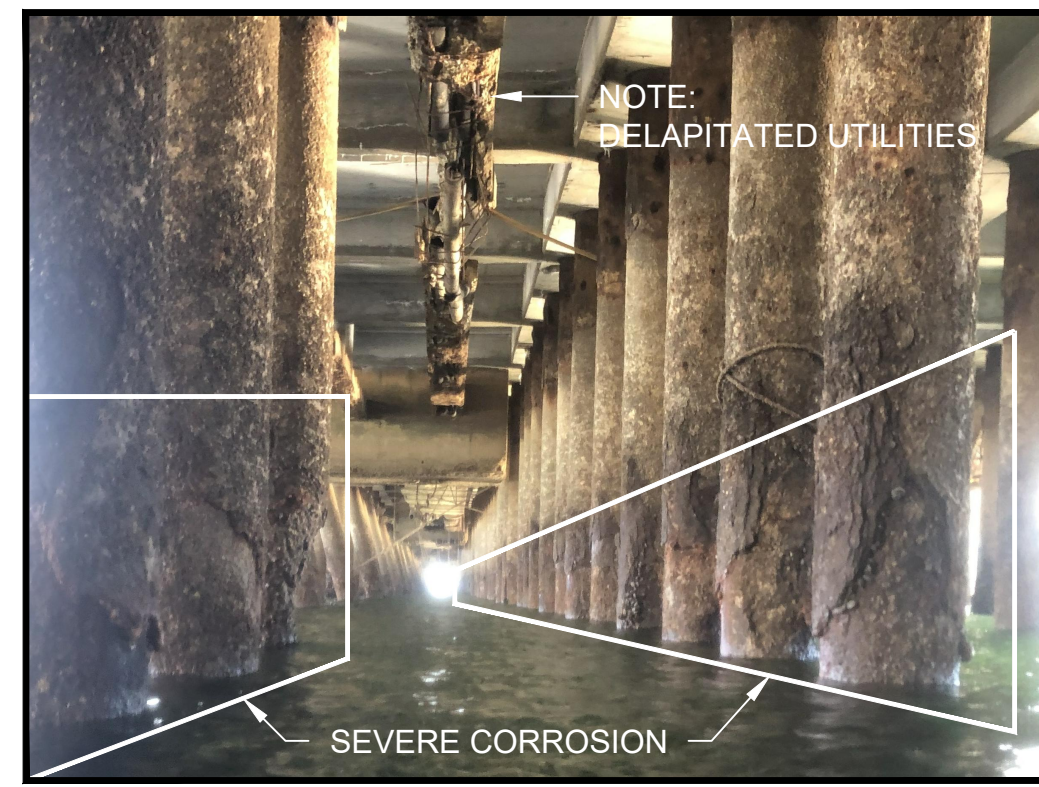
SEVERE CORROSION OF PILES (TYP.)
